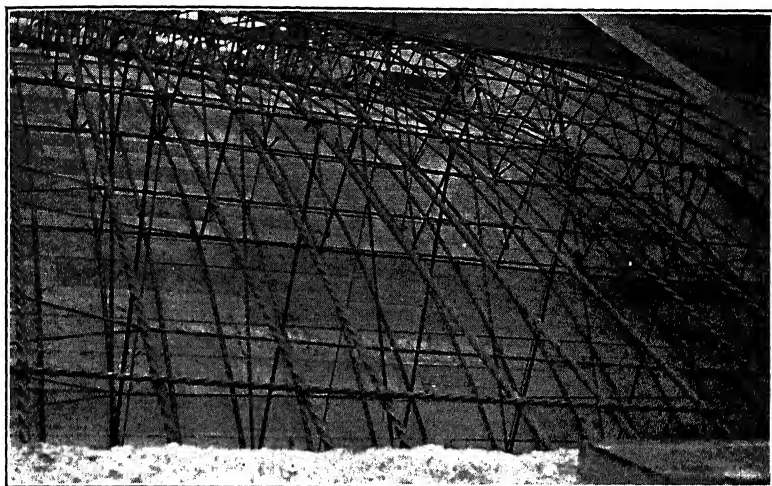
North Michigan Street bridge, South Bend, Indiana. Reinforcement supported in place.
